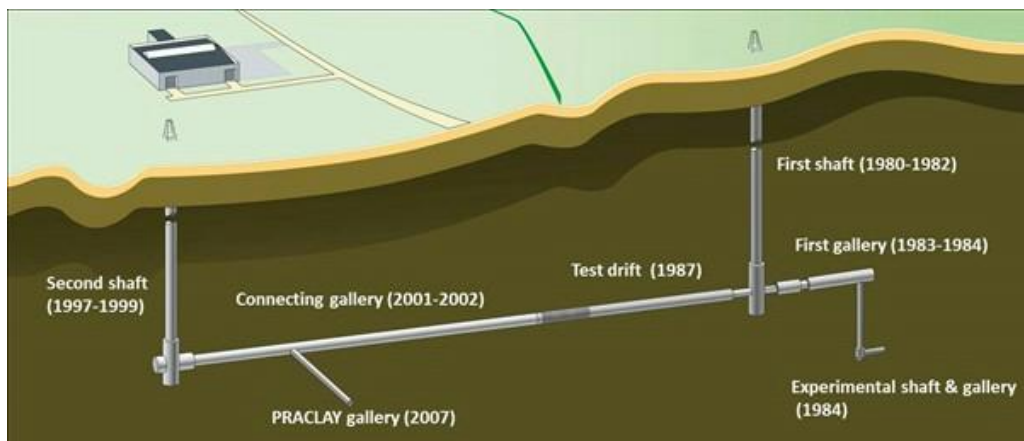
Layout of the underground laboratory at Mol, Belgium (EURIDICE website, 2018)
